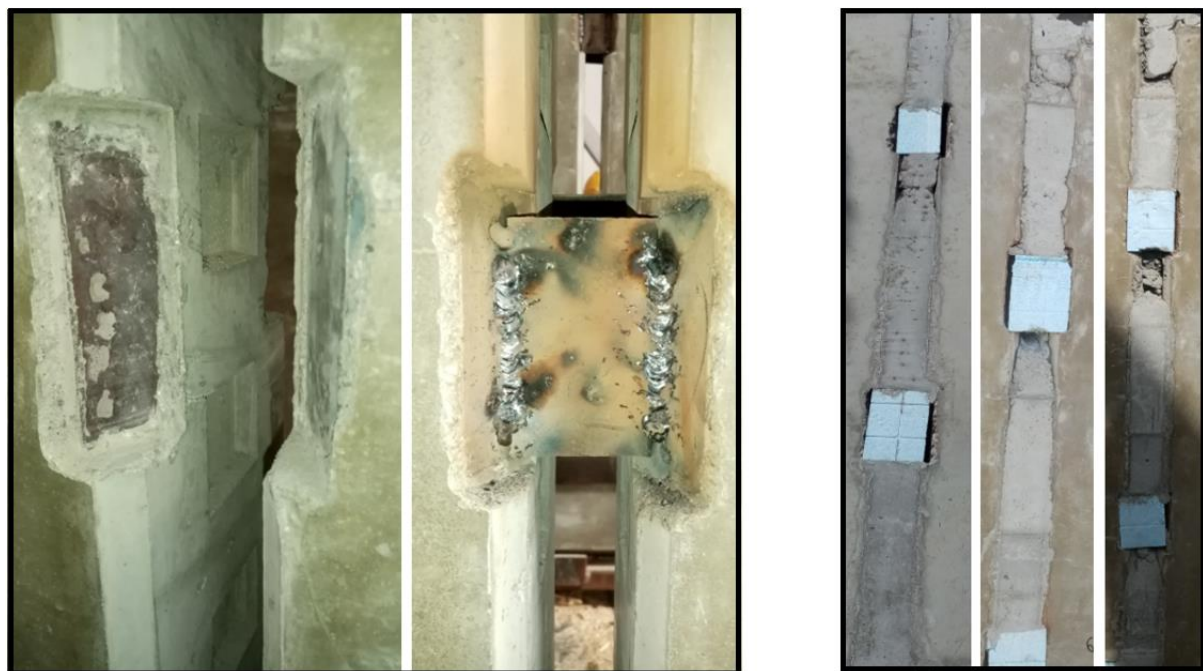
Joint casting (left image: 1<sup>st</sup> test before grouting; right image: 1<sup>st</sup>, 2<sup>nd</sup> and 3<sup>rd</sup> test specimen after grouting)
